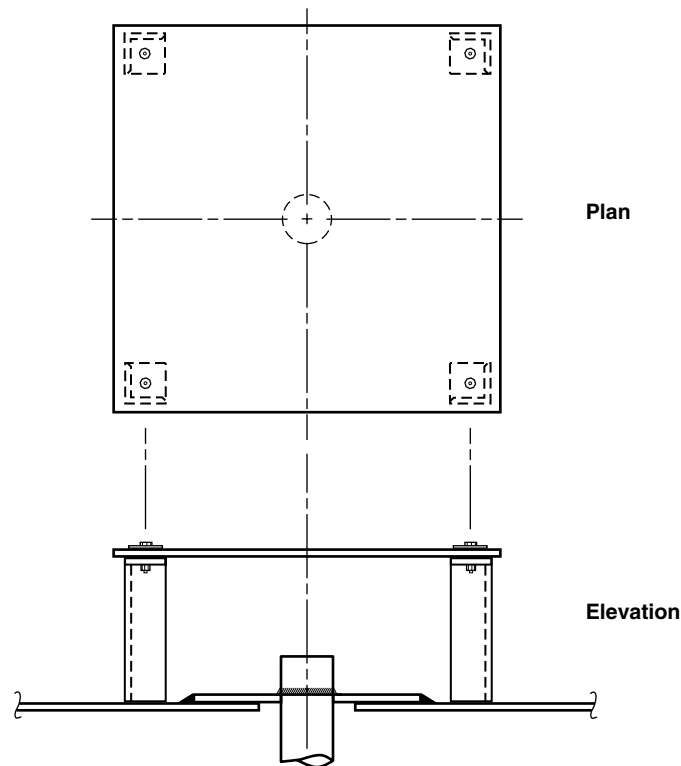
Nonrecessed inlet-outlet pipe bottom connection details
